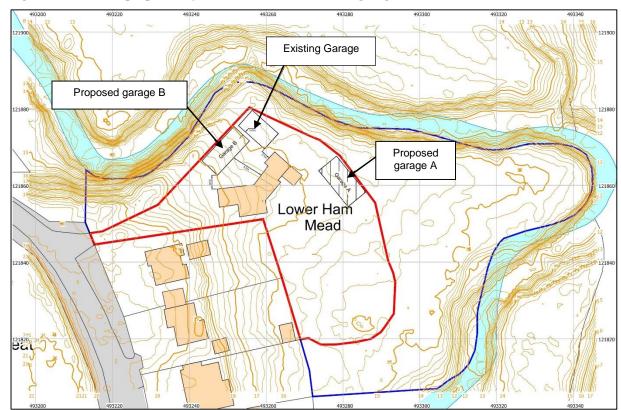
Plan of the proposed layout at the site, with the new garages shown, contour interval 0.2 m
